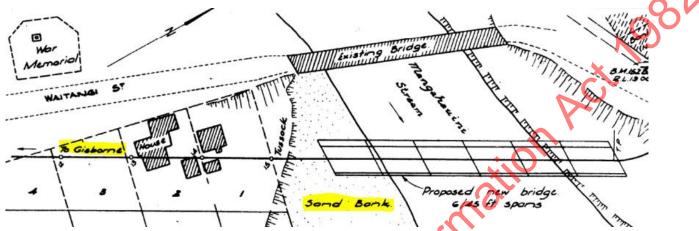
Snip from as-built drawings showing plan of Mangahavini No. 1 Bridge
